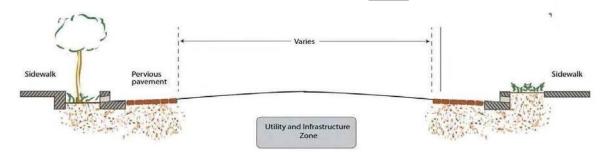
Possible pervious pavement design layout (Model for Living Streets Design Manual, 2011).
